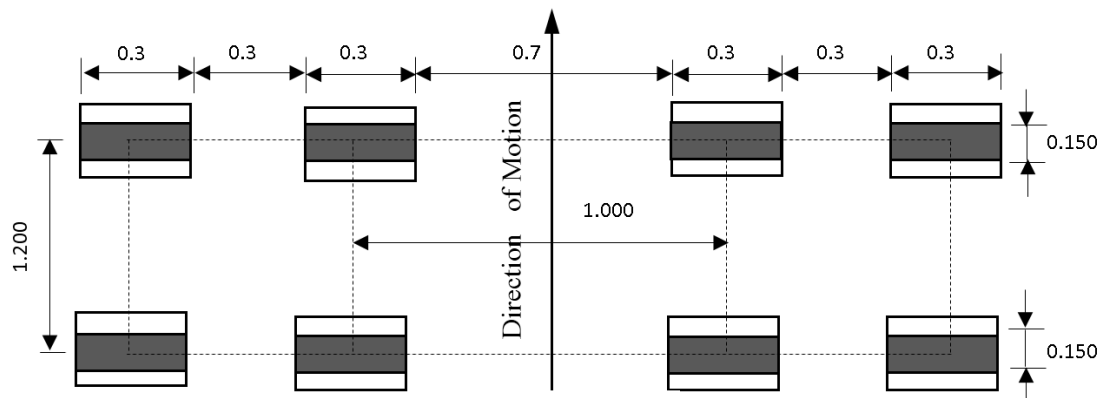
Plan view of IRC Class AA Loading (all dimensions are in m).
